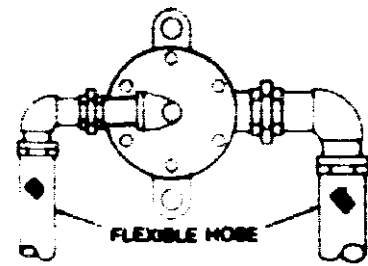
Recommended use where joint body supports, lugs and rods are installed in a vertical plane.
